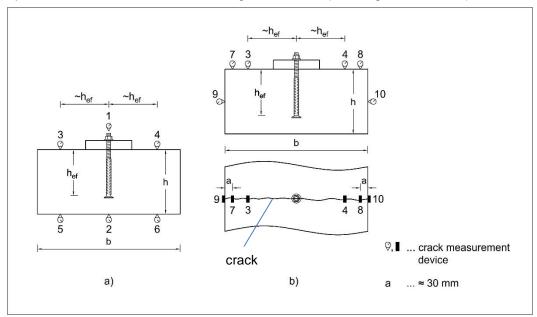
Measurements for one crack at one anchor bolt to show fulfilment of the constant crack width requirement (for crack inducing with crack inducer and aluminium foil see Figure A.1.2.1.1)
